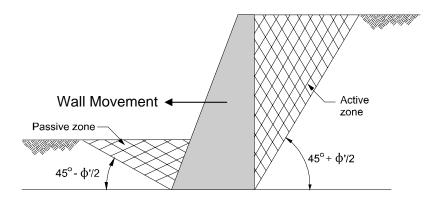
Development of Rankine active and passive failure zones for a smooth retaining wall.
